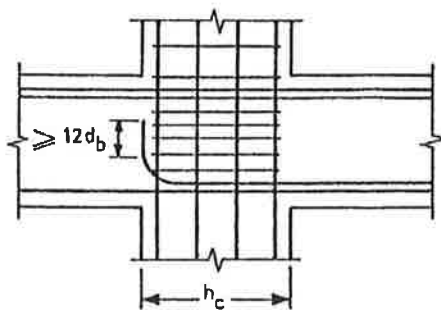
TERMINATION OF BEAM BARS AT AN INTERIOR JOINT
